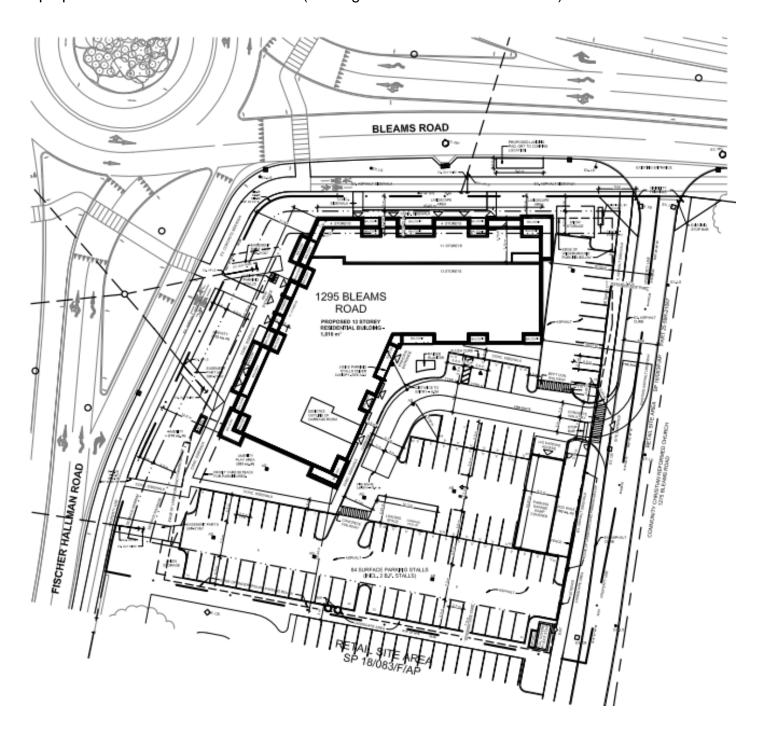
Excerpt of Conditionally Approved Site Plan Drawing
